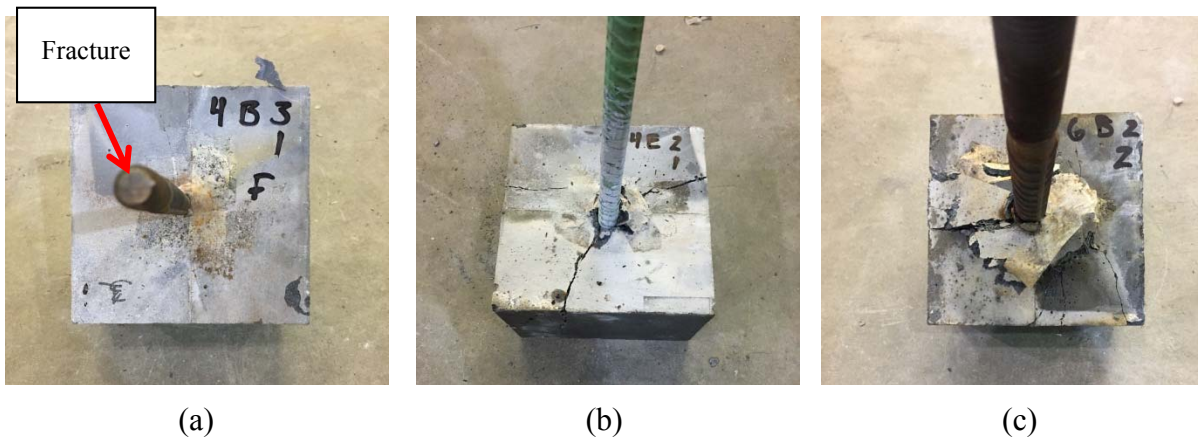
(a) Bar Fracture, (b) Bar Slip, and (c) Conical Concrete Failure
